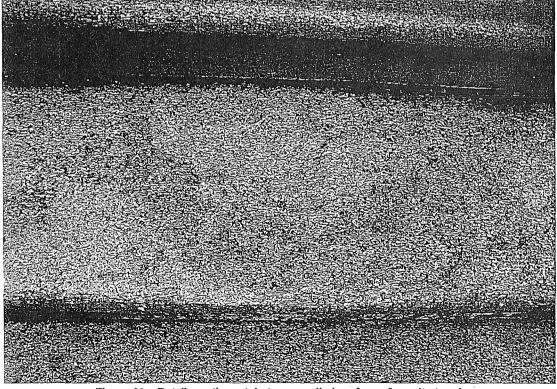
Detail, south portal steps, spalled surface of granite tread.
